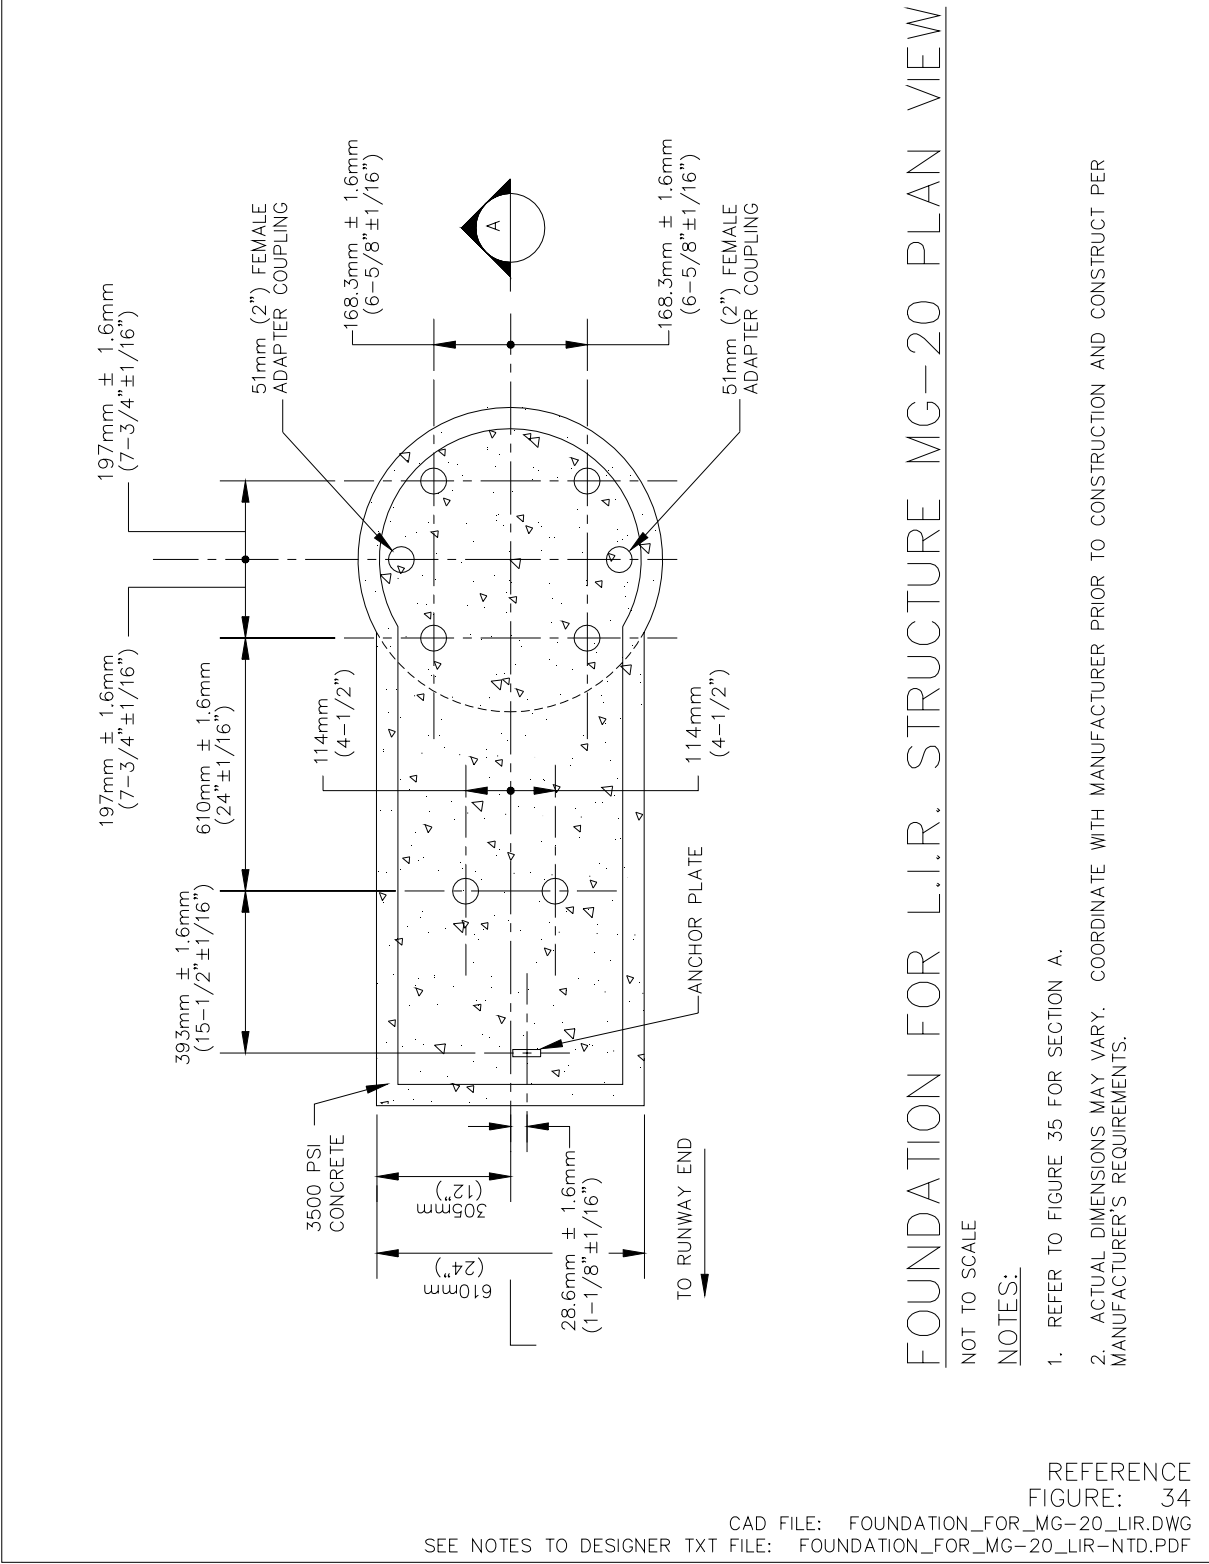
Foundation for L.I.R. Structure MG-20 Plan View
